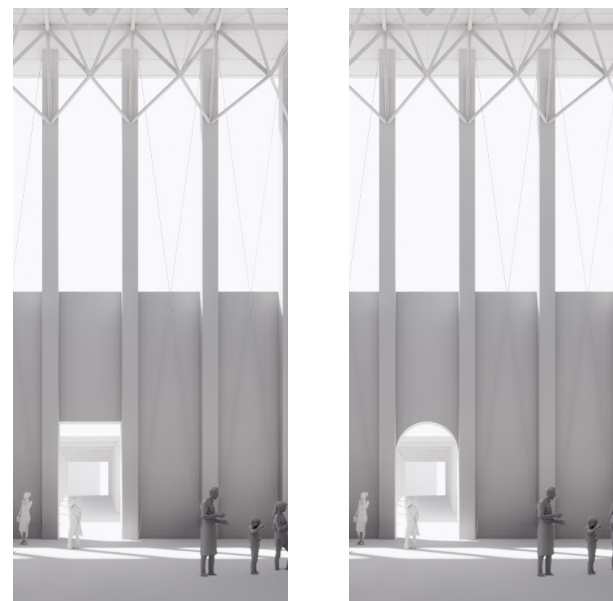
Adapting the rammed earth openings to work in compression by introducing a suitable arch opening.
